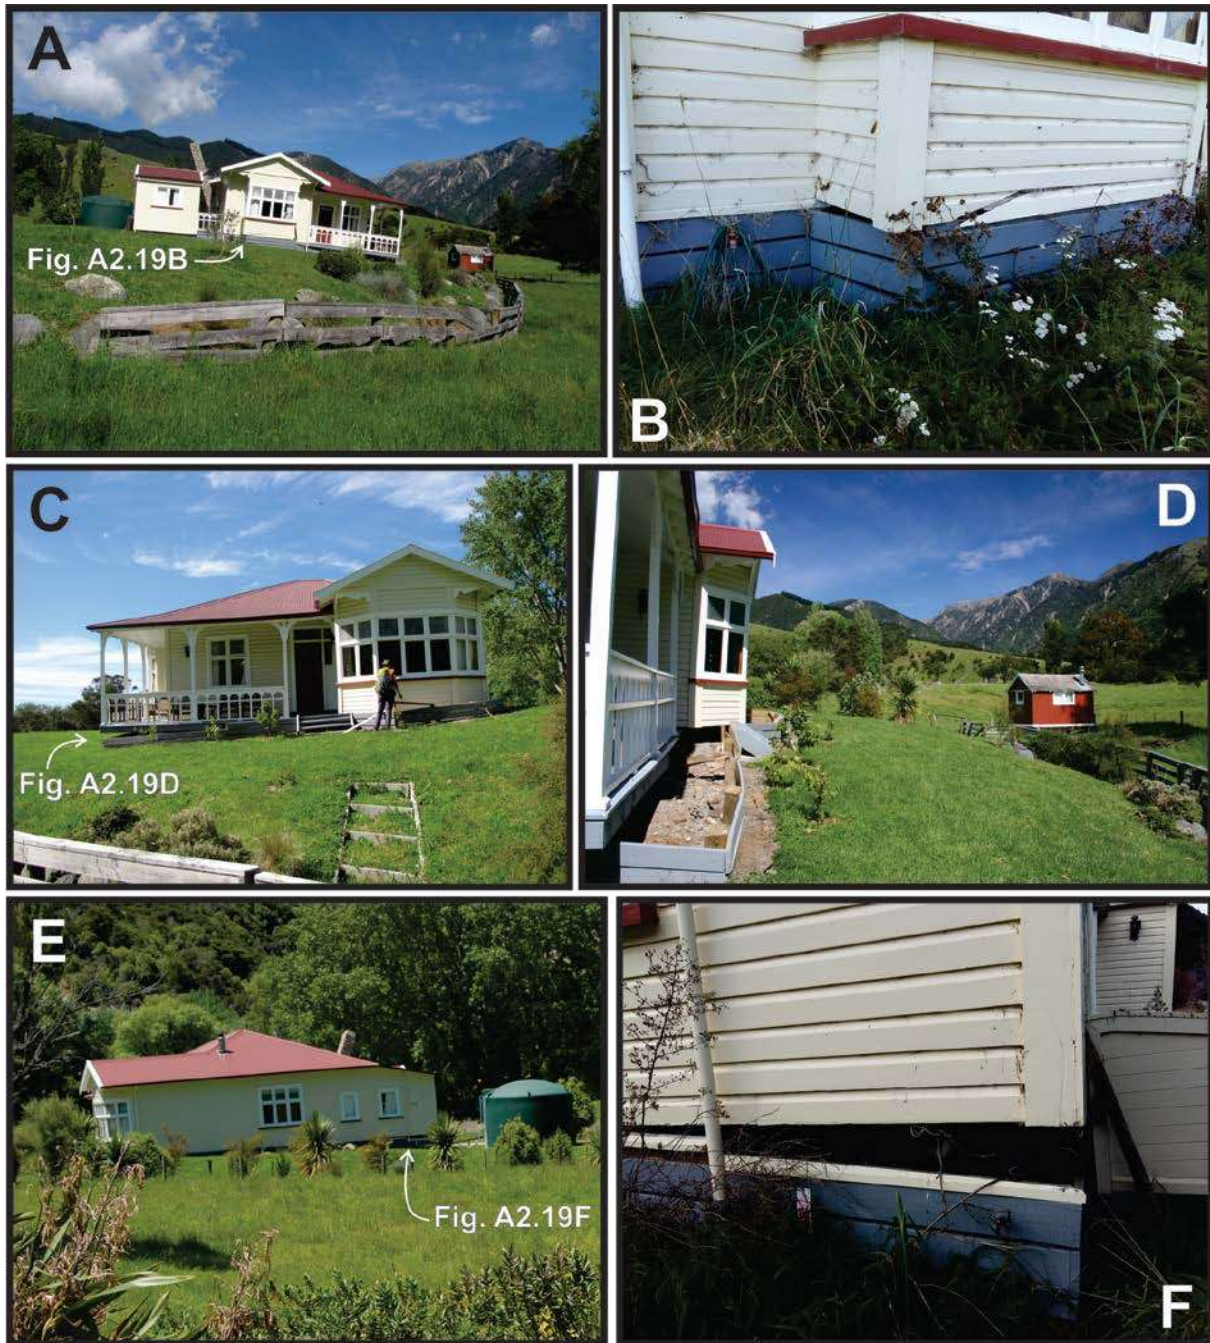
Harkaway Villa and Papatea Fault surface rupture. (A) View looking west showing northeast-ward tilt of the villa on the up-thrown (hanging-wall) side of the Papatea Fault. Photo by Julie Rowland, taken in November 2016. (B) View looking northwest showing detail of damage to the east side of the villa. Photo by Julian Garcia-Mayordomo, taken about 18 months after the 2016 Kaikōura earthquake. (C) View looking south of the north side of the villa. Photo by Rob Langridge, taken in November 2016. (D) View looking west of the north side of the villa, showing offset of the foundation piles from the superstructure. Photo by Julie Rowland, taken in November 2016. (E) View looking east of the west side of Harkaway Villa. Photo by Rob Langridge, taken in November 2016. (F) View looking east, showing detail of damage to the west side of the villa. Photo by Julian Garcia-Mayordomo, taken in May 2018.
